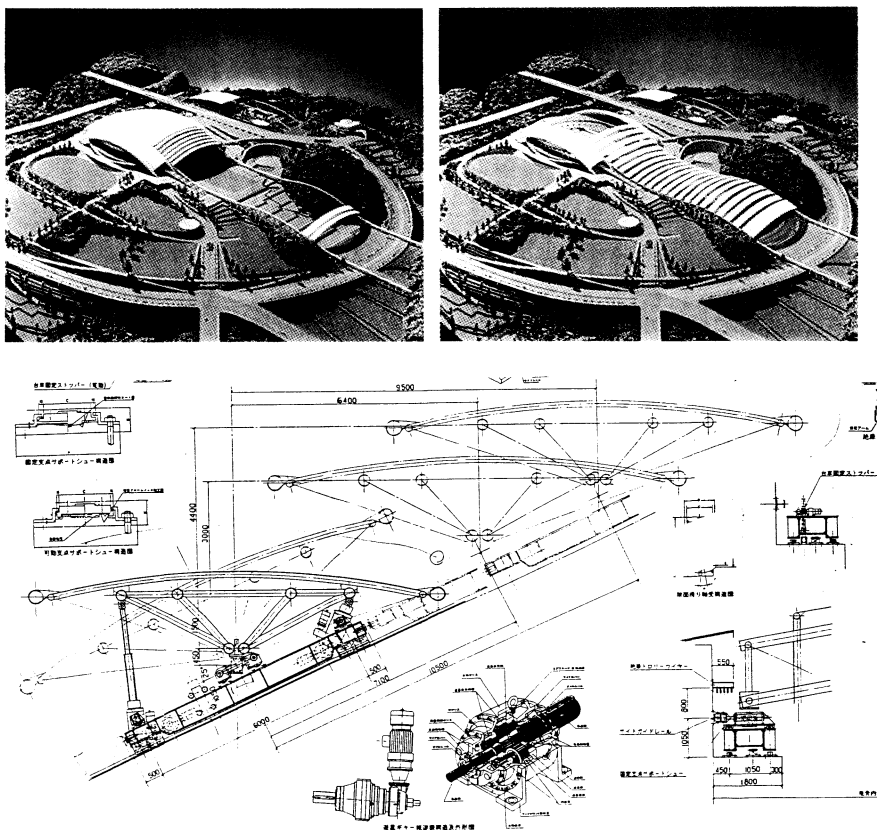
Open and closed position of central movable roof; driving mechanism of roof panels.
